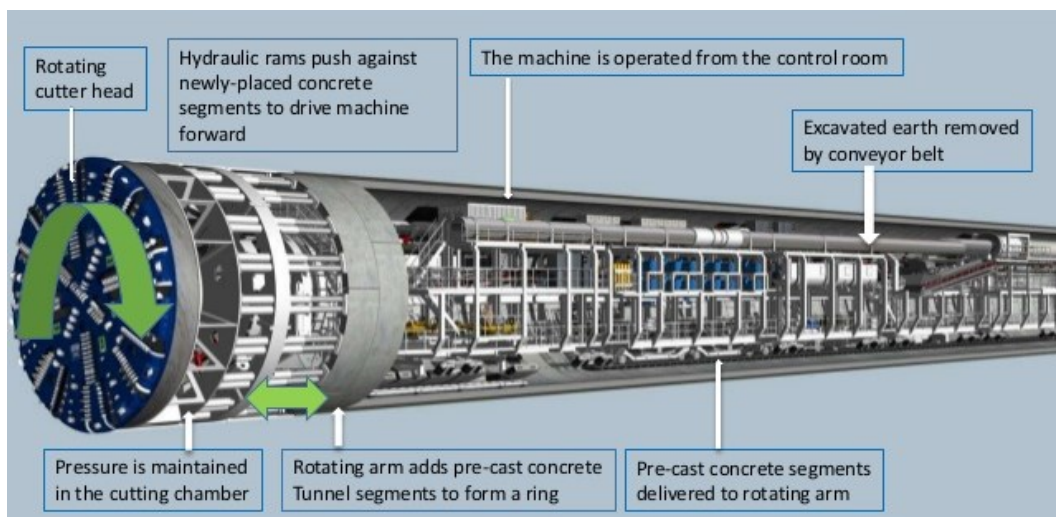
Longitudinal section of a Tunnel Boring Machine
